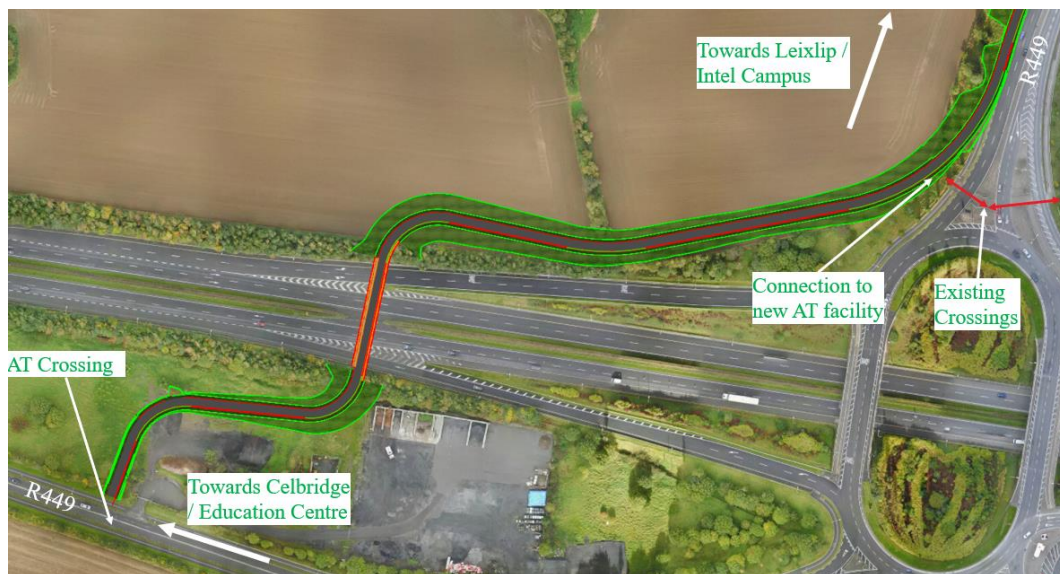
Option 1 - Active Travel Overbridge west of Junction 6 Celbridge
